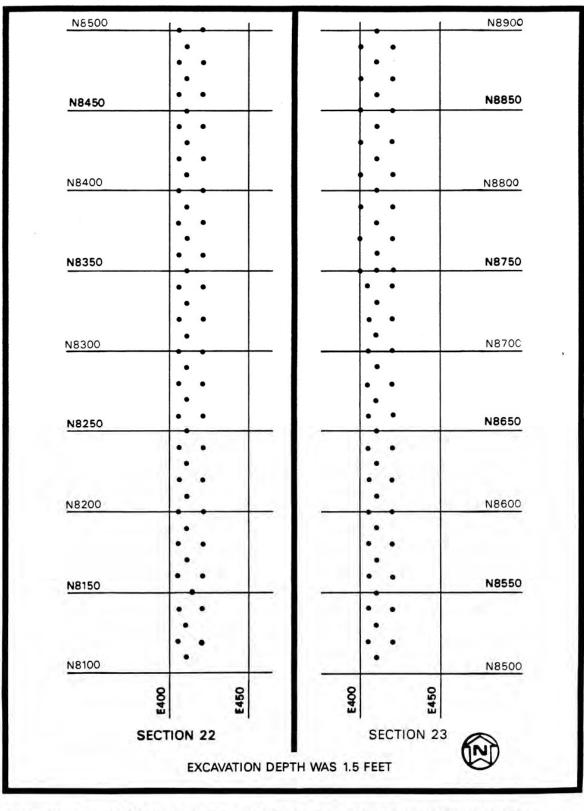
POST-REMEDIAL ACTION SAMPLING LOCATIONS ON THE CENTRAL DRAINAGE DITCH - SECTIONS 22 AND 23
